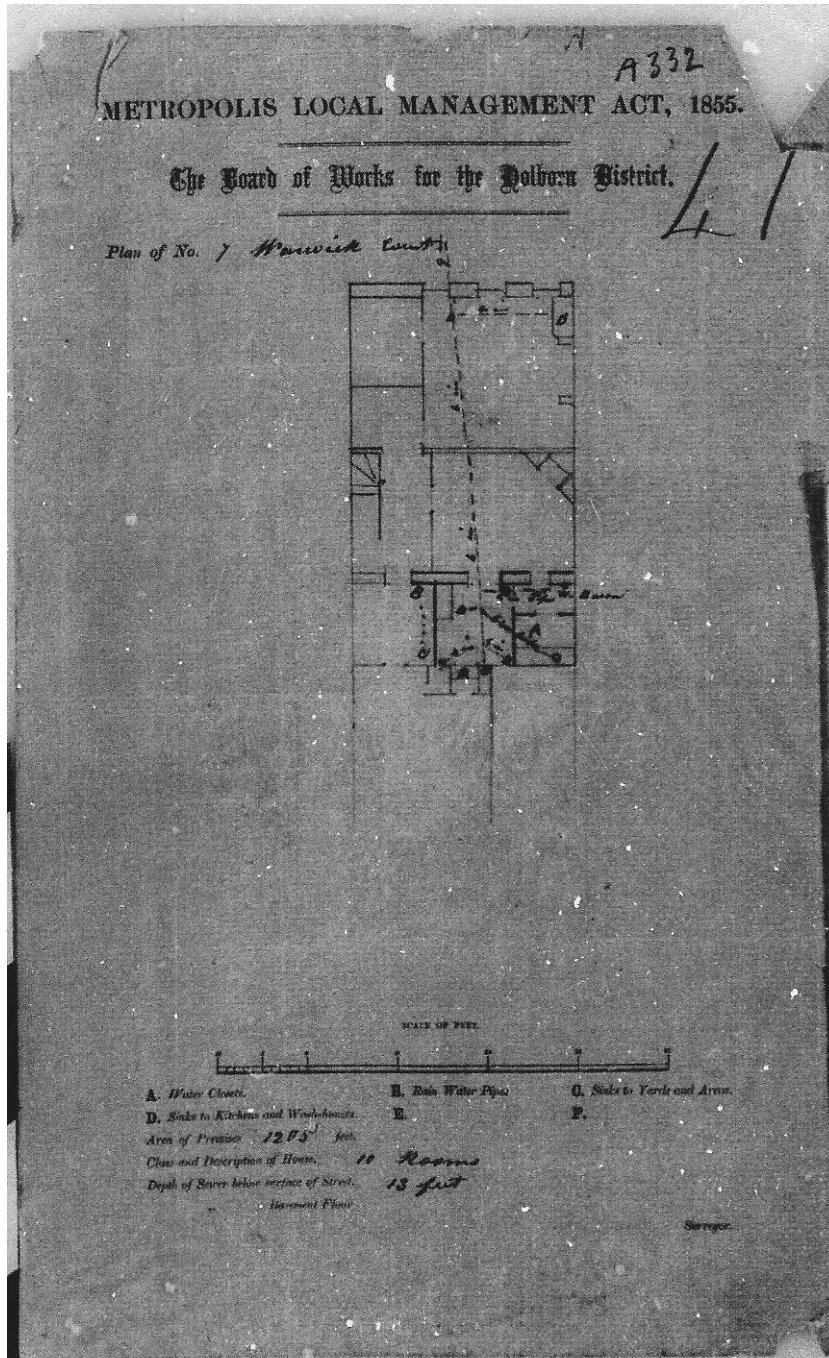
Undated drainage plan submitted to the Board of Works (in existence between 1855 and 1889) (Camden Local Studies and Archives Centre)
